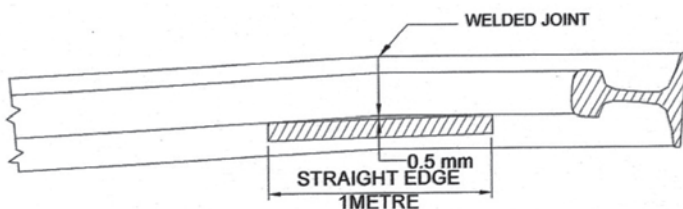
(g) Tolerance for Lateral Misalignment of Welded Joint with Old Rails
